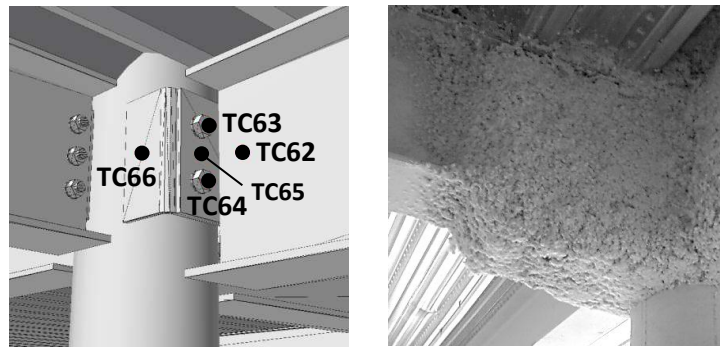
Fire protected beam-to-column connection (B2-C2 to B2) in the 1st floor
